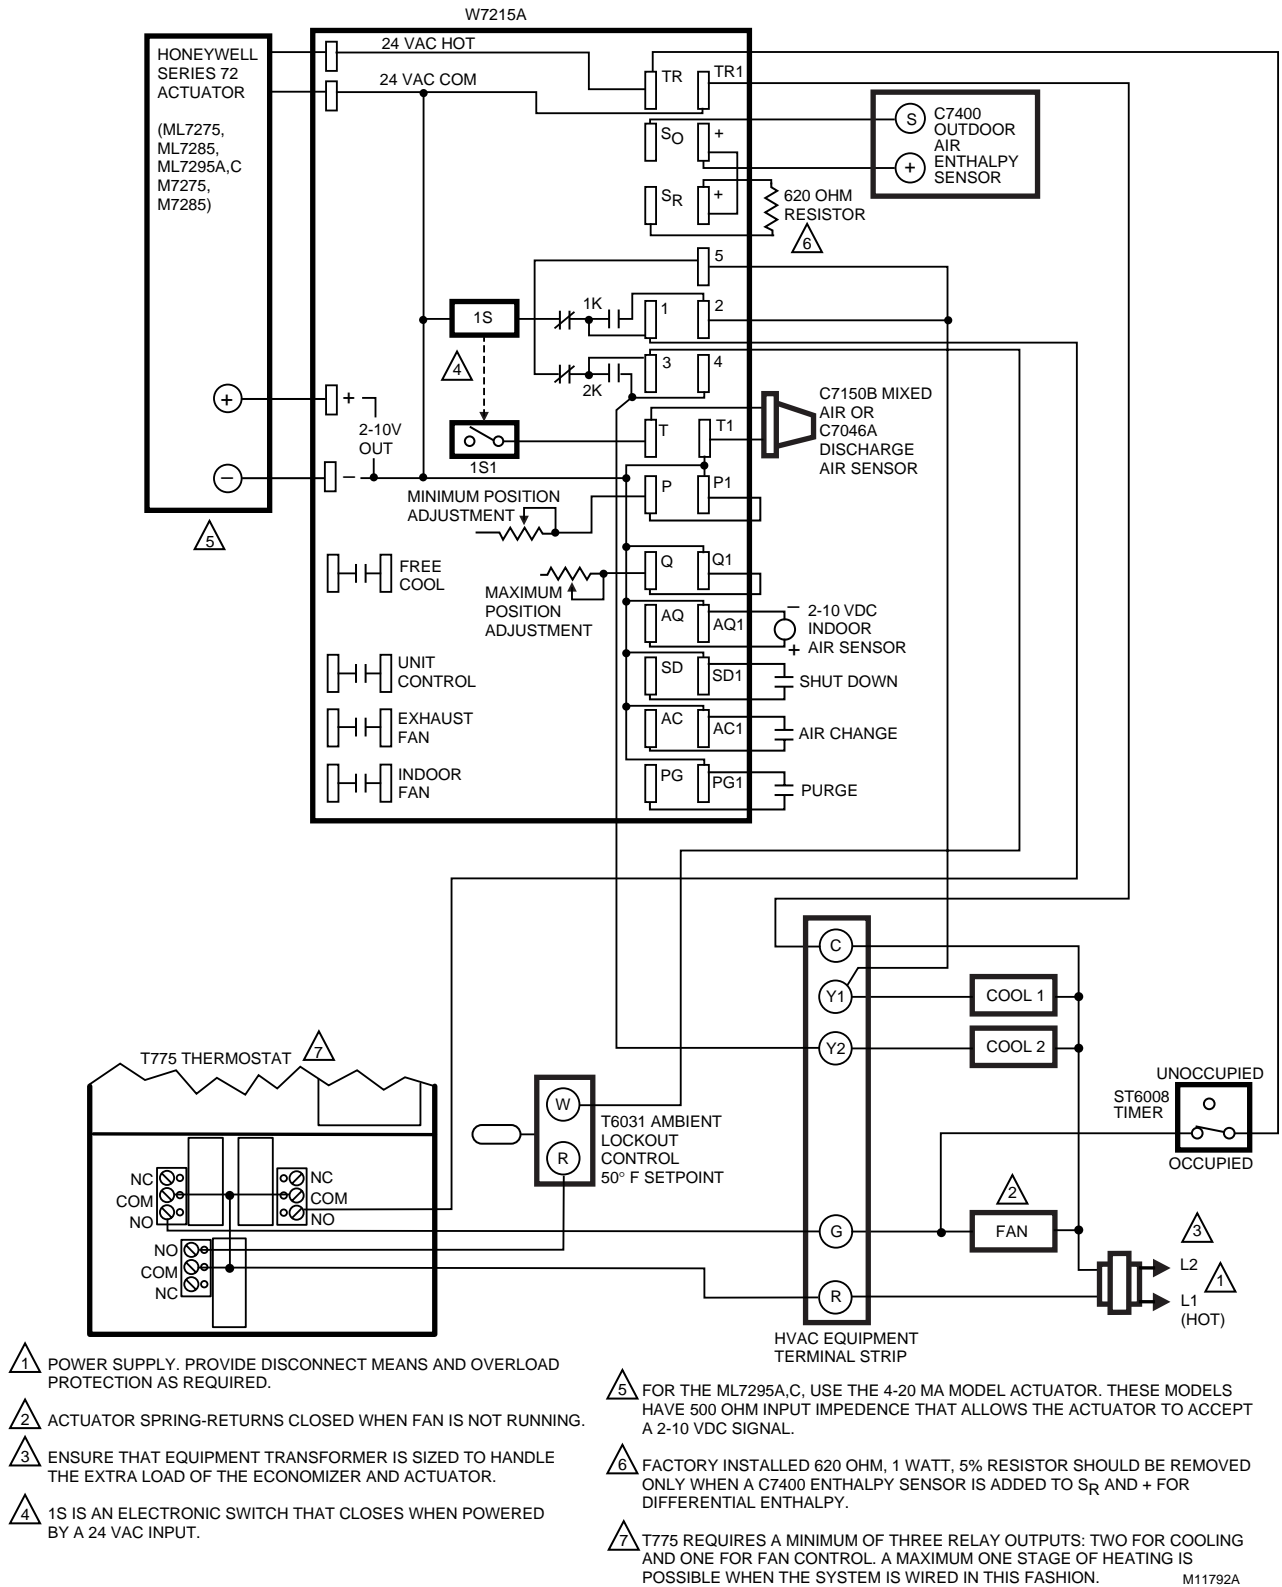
W7215A used with T775 Controller and Honeywell Series 72 Actuator.
